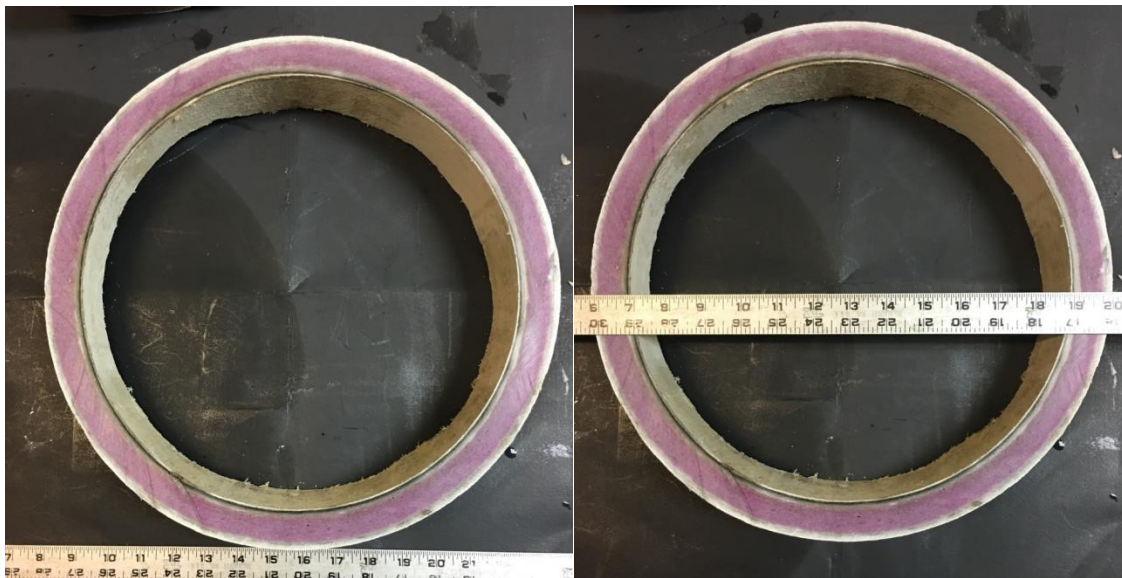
Photographs of sample 3 wall cross section after staining with phenolphthalein. Note the white areas showing loss of alkalinity
